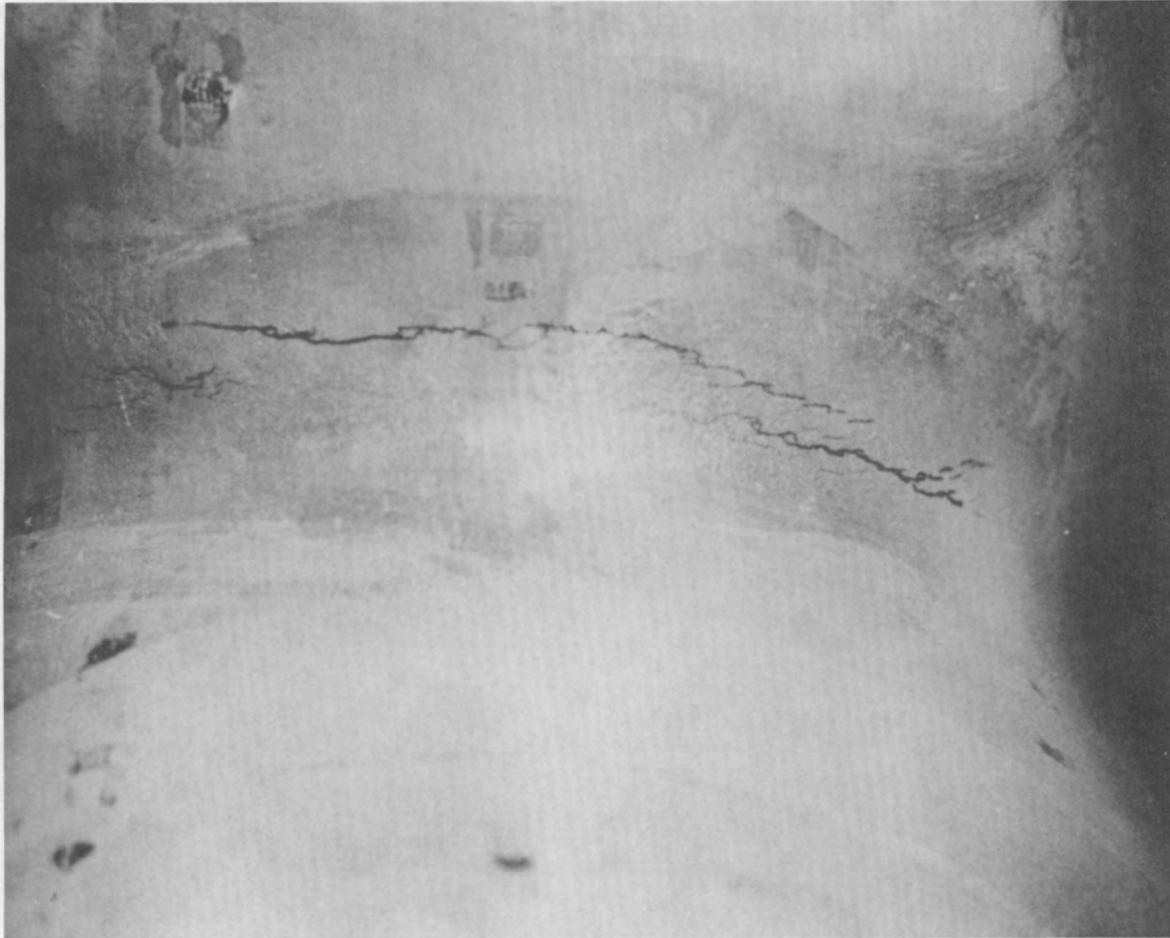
Fatigue cracks in T-7 after 9947 cycles.
